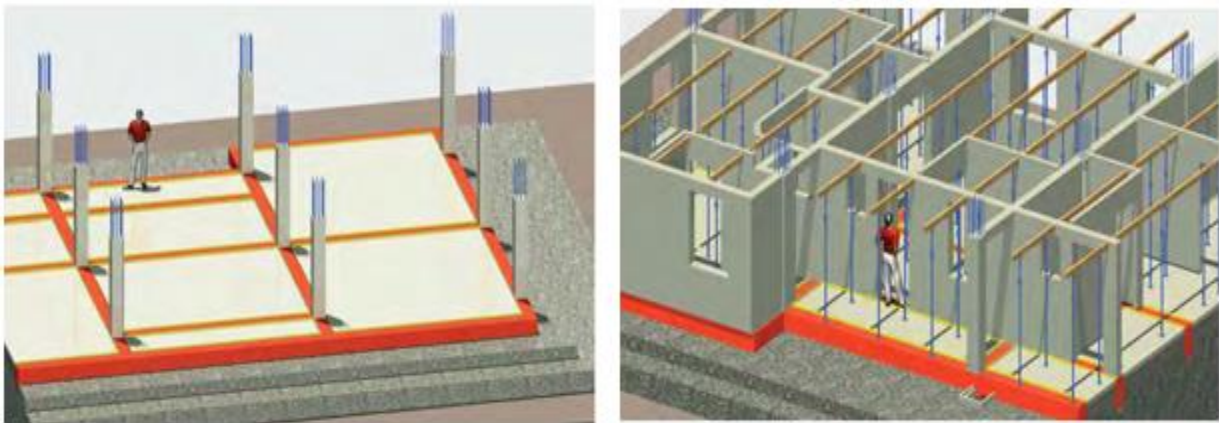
Left) Grade beam and Column Arc design Right) Temporary support for precast beam arc design by GTZ and MH engineering
